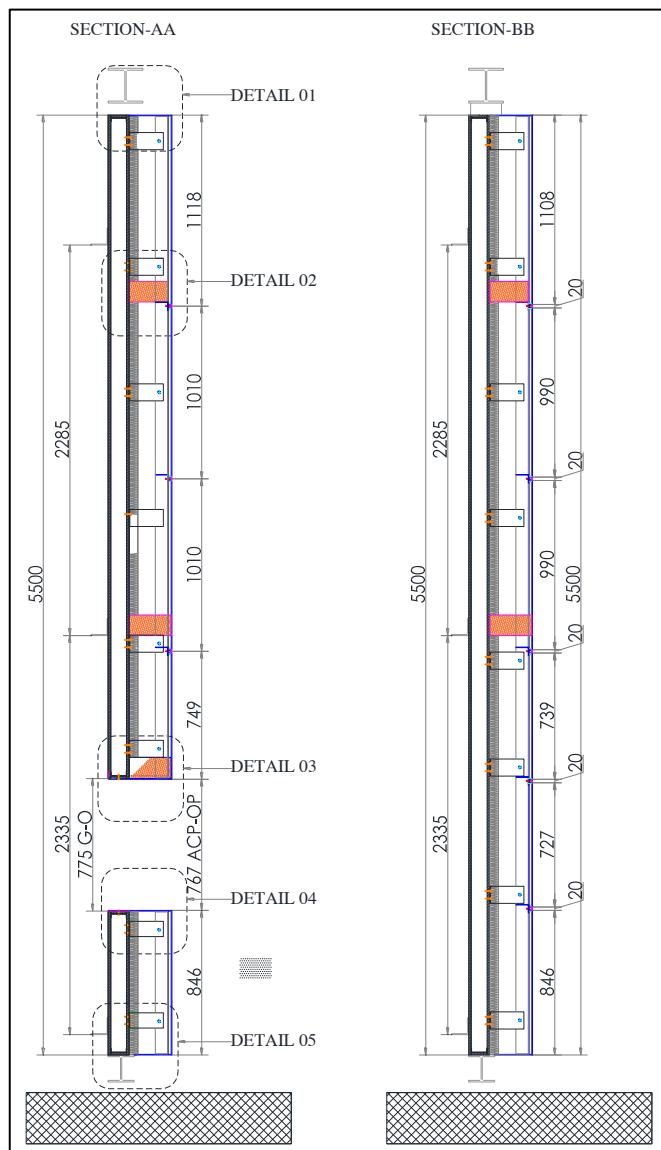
Elevation view of the Horizontal Cavity Barriers, vertical cavity barriers and external insulation assembly.
